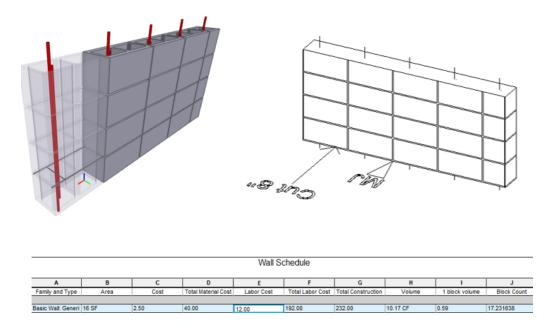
REVIT/Masonry iQ model of the masonry wall designed by the students
